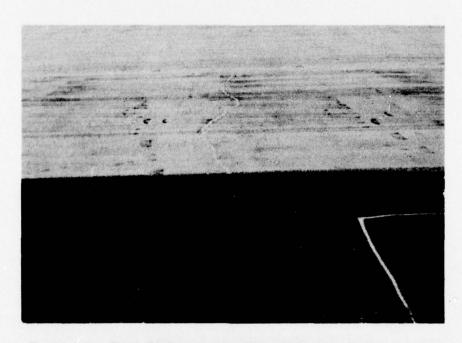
Fort Devens--unsealed crack under Bidim C-22 fabric in apron test area
